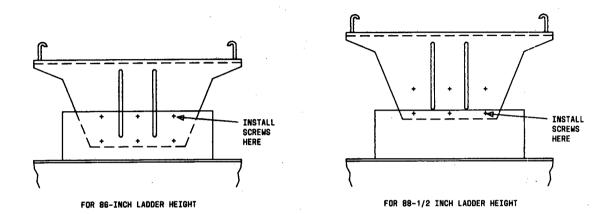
Ladder Rack Supported 86 or 88-1/2 Inches From Floor (GRP 33)
